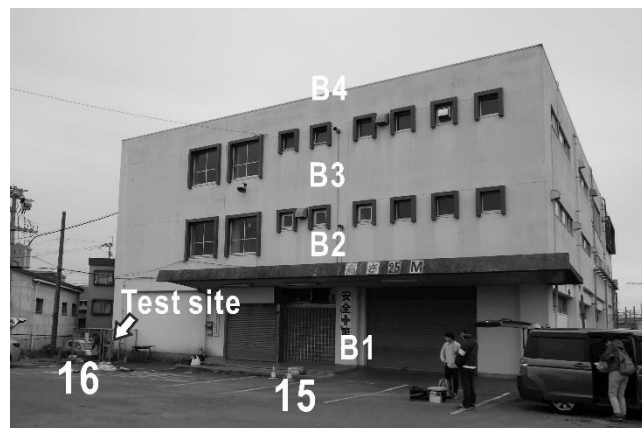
Temporal earthquake observation stations deployed at the test site and the building [CTOC07]
